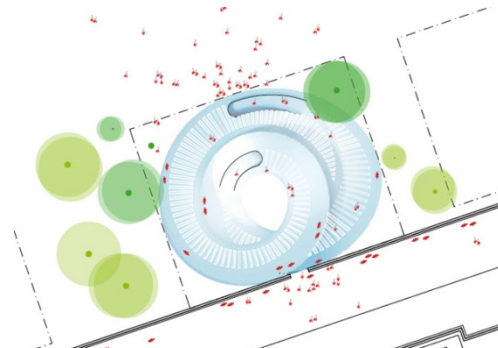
Site Plan of BIG's Denmark Pavilion²²¹
